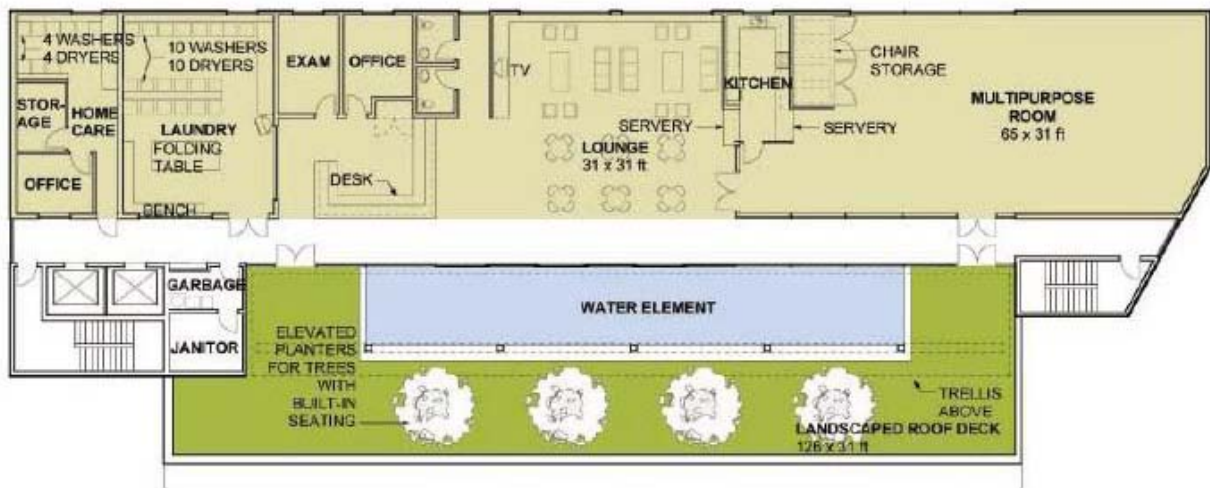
West Hastings Street - Singles Non-Market Residential: Amenity Floor Plan (Source: Henriquez Partners Architects, nd).
